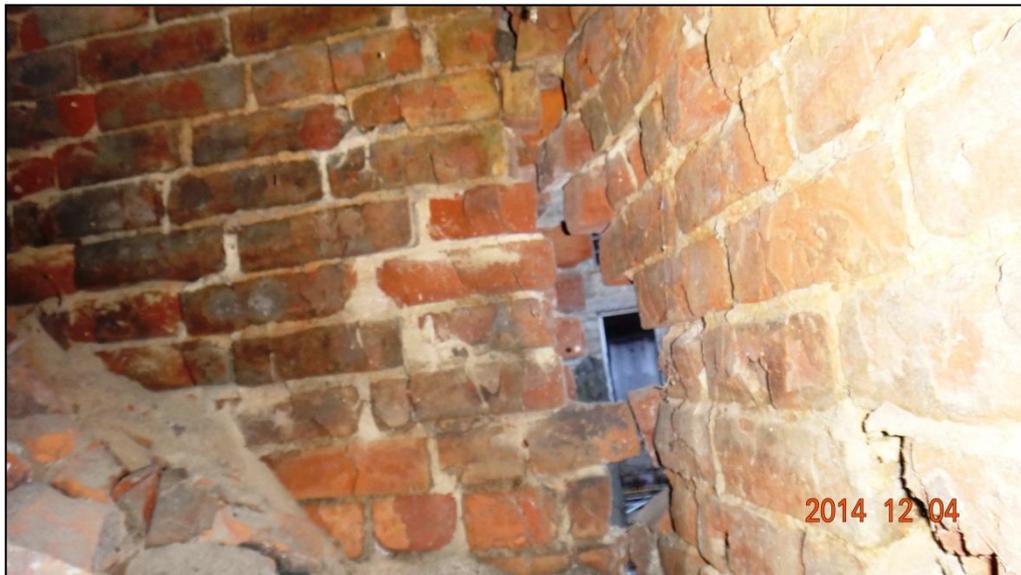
This photograph shows the displacement and bowing of the outer wythes of brick relative to the interior brick wall that is part of the clean-out chamber below the breach on the north side of the chimney.
